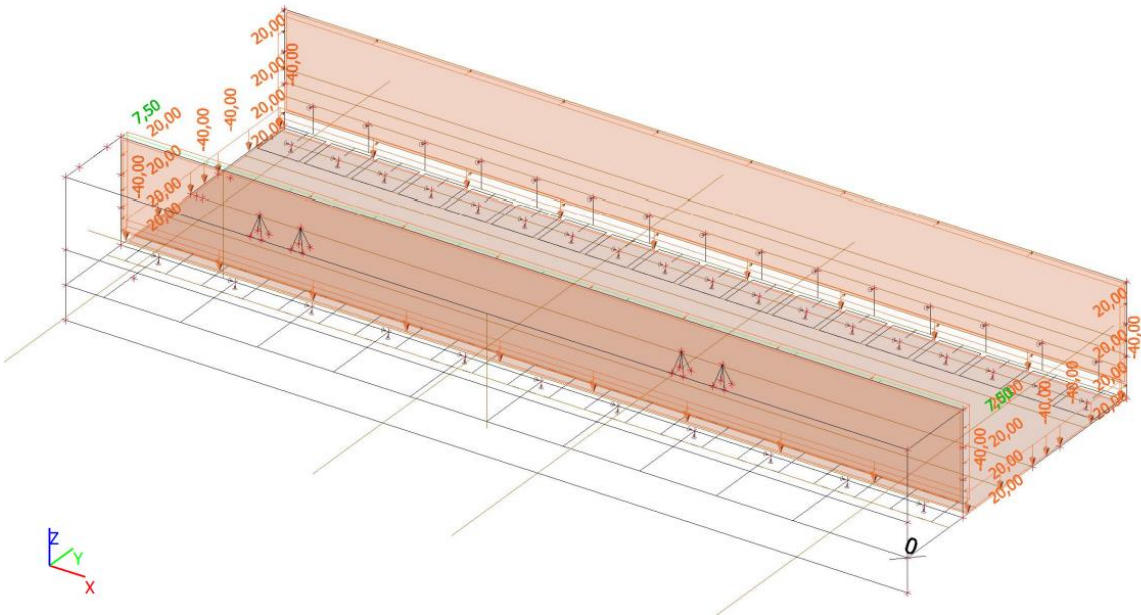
2.5D model: LC4-2- Terrain load above the relief floor
